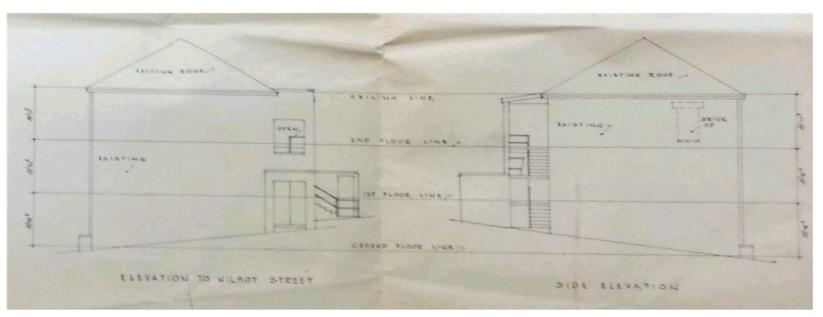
Side elevations of the conversion of Wilmot Terrace. Note the proposed ground floor line which suggests that there was excavation to achieve this (when read in conjunction with the figure below.
